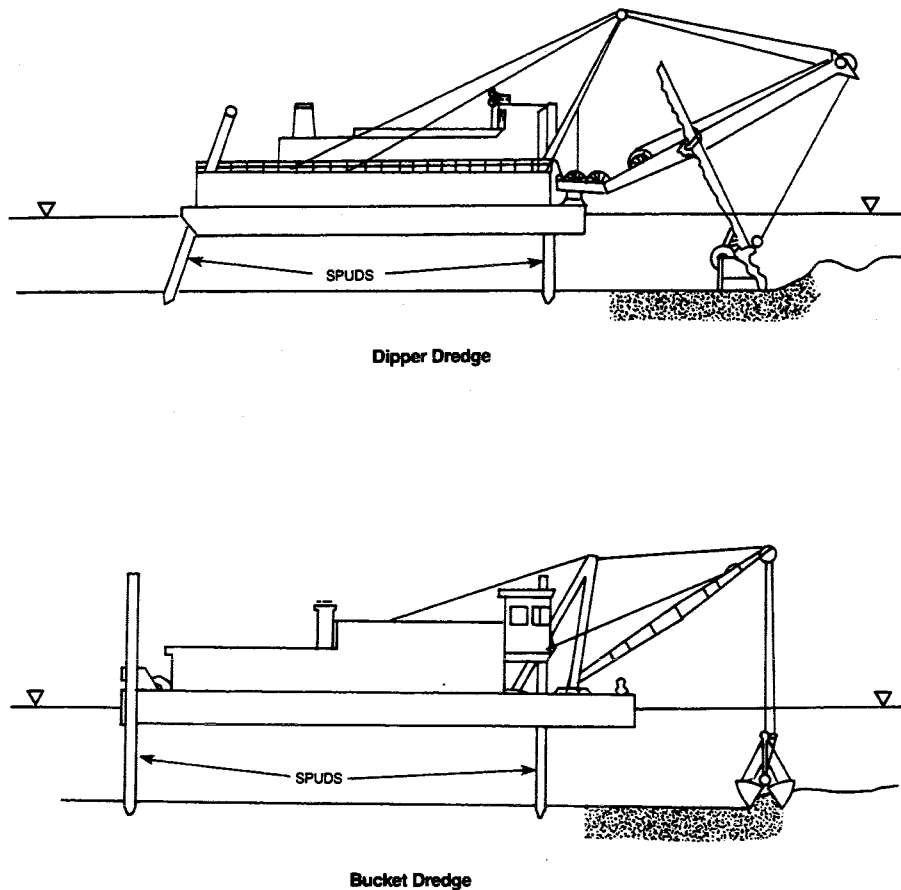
The dipper dredge and bucket dredge (clamshell)
